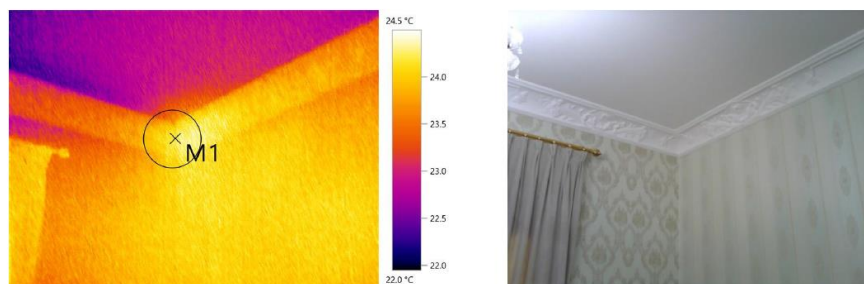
Thermal image of southwest wall of RC02 showing a temperature difference between the concrete wall-to-wall and wall-to-ceiling joints. The temperature at the hotspot is 25.1 °C. The thermal image was taken on November 17, 2021 at 1:00 pm.
